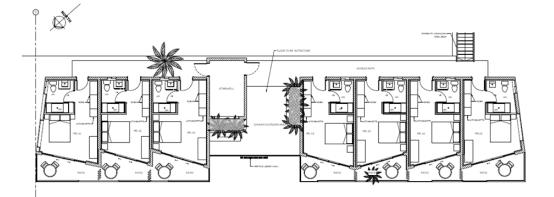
Proposed Hotel Second Floor Plan (7 rooms)
